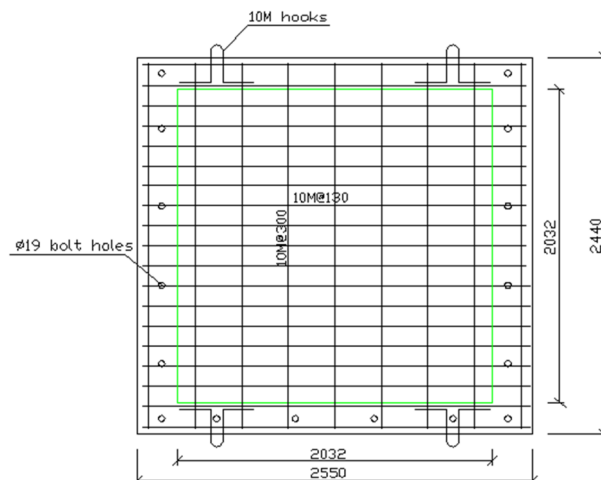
Reinforcement details of reinforced concrete walls (all dimensions in mm)
